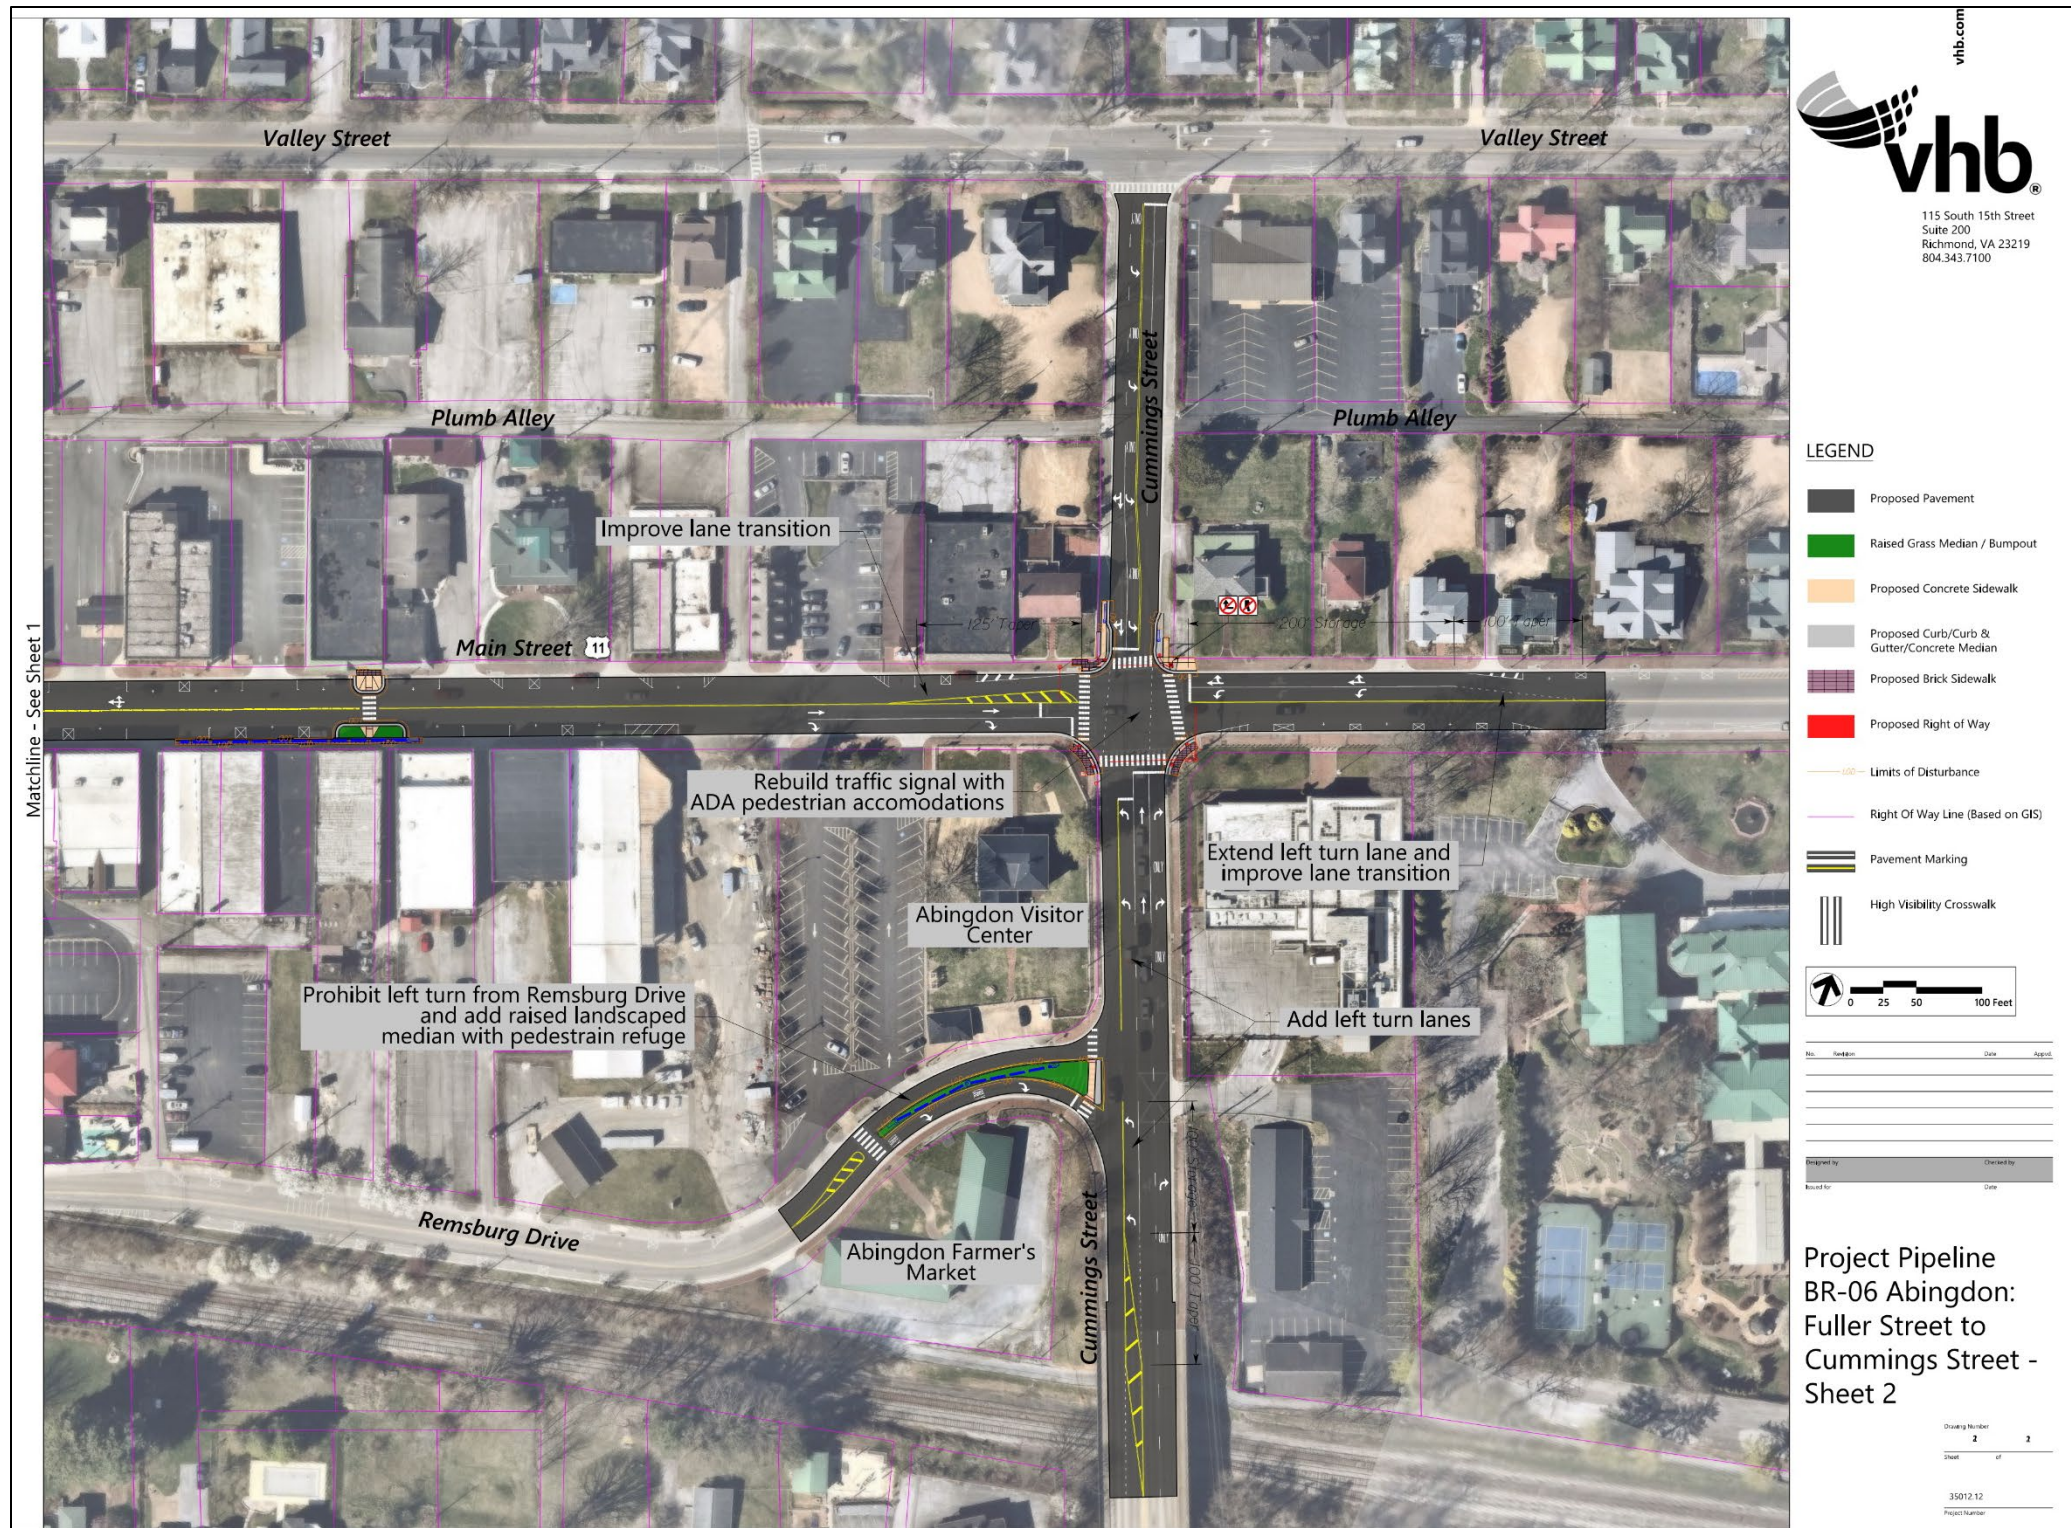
Fuller Street to Cummings Street Improvements - Sheet 2
